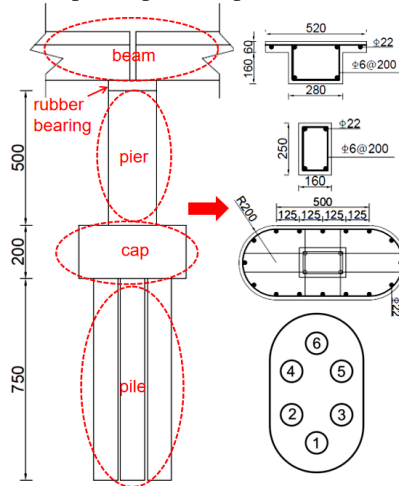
The dimensional drawing of the scaled full-bridge model (mm).
